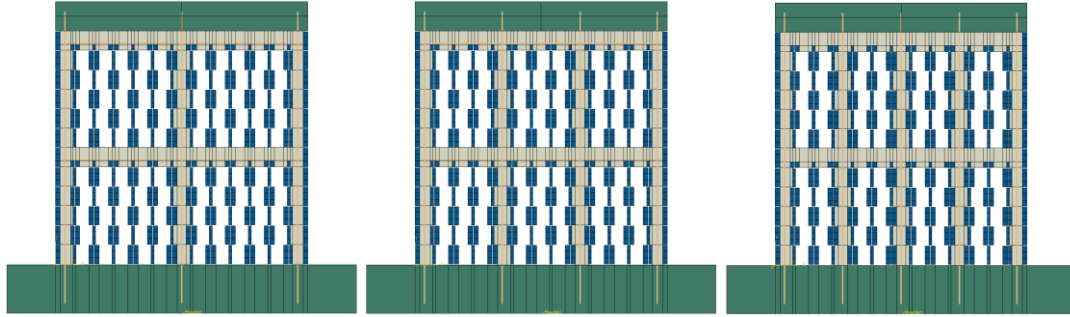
Grout Core Spacings (2.4 m Wall Height, 1.2 m Bond Beam Spacing)
